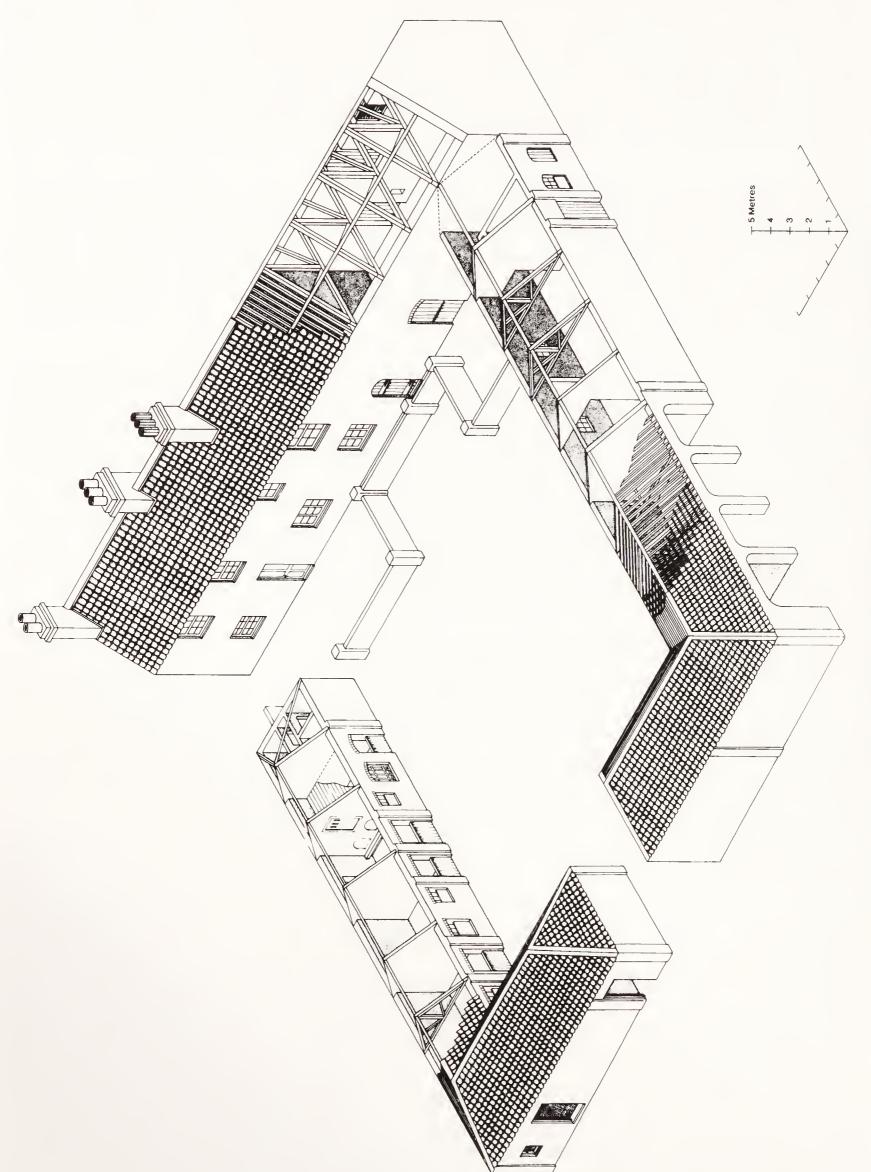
Isometric View of Vessey Pasture Farmstead c. 1850. [drawn by Kevin Burkhill].
